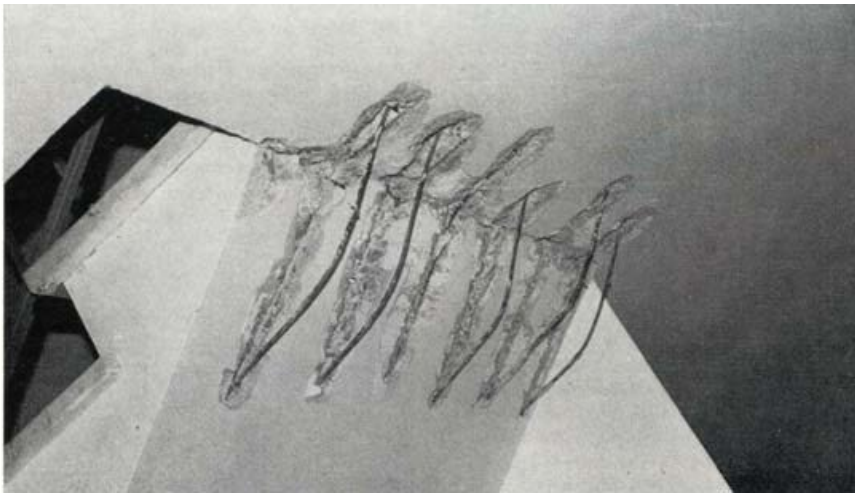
Irpinia earthquake (1981), concrete cover spalling due to an incorrect positioning of bended steel rebars in a staircase flight.
